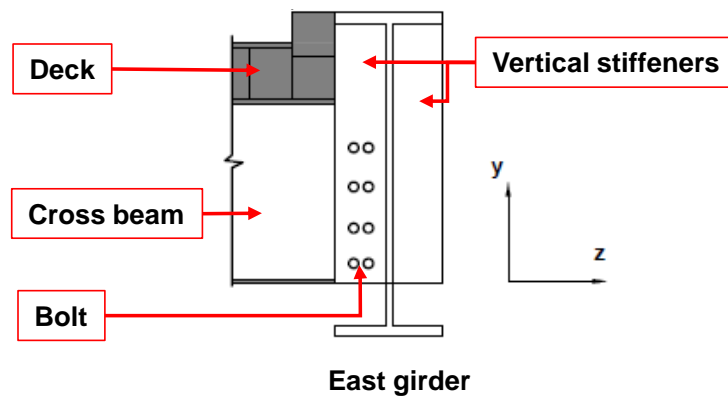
Schematic of vertical transverse web stiffeners welded to east web girder.
